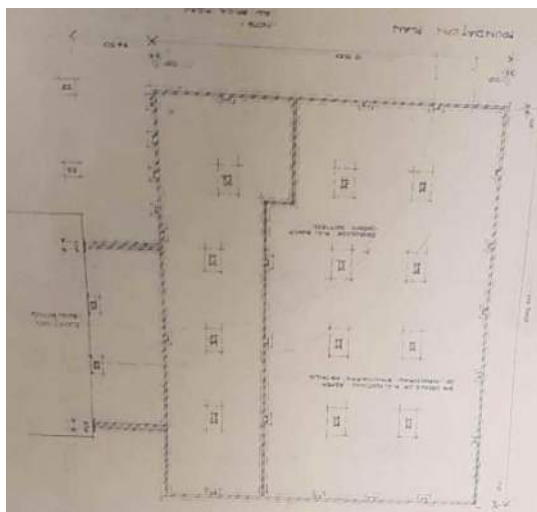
Existing structural drawings showing footings and basement walls.
